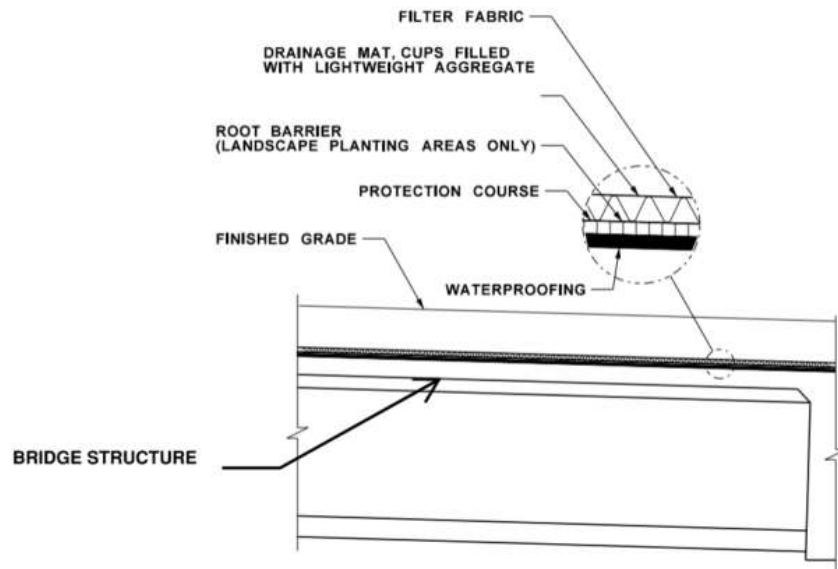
Concept of drainage mat system (Source WSDOT Mountlake LID Bridge Design-Build Package).
